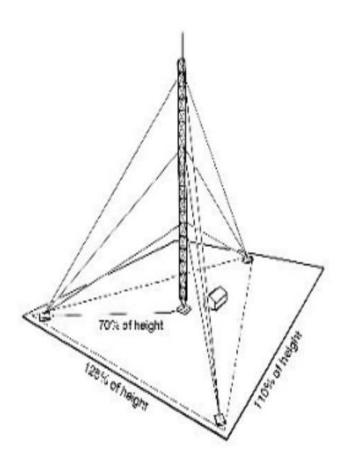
Guyed tower (Source: Etisalat Tower Specification, 2012)
